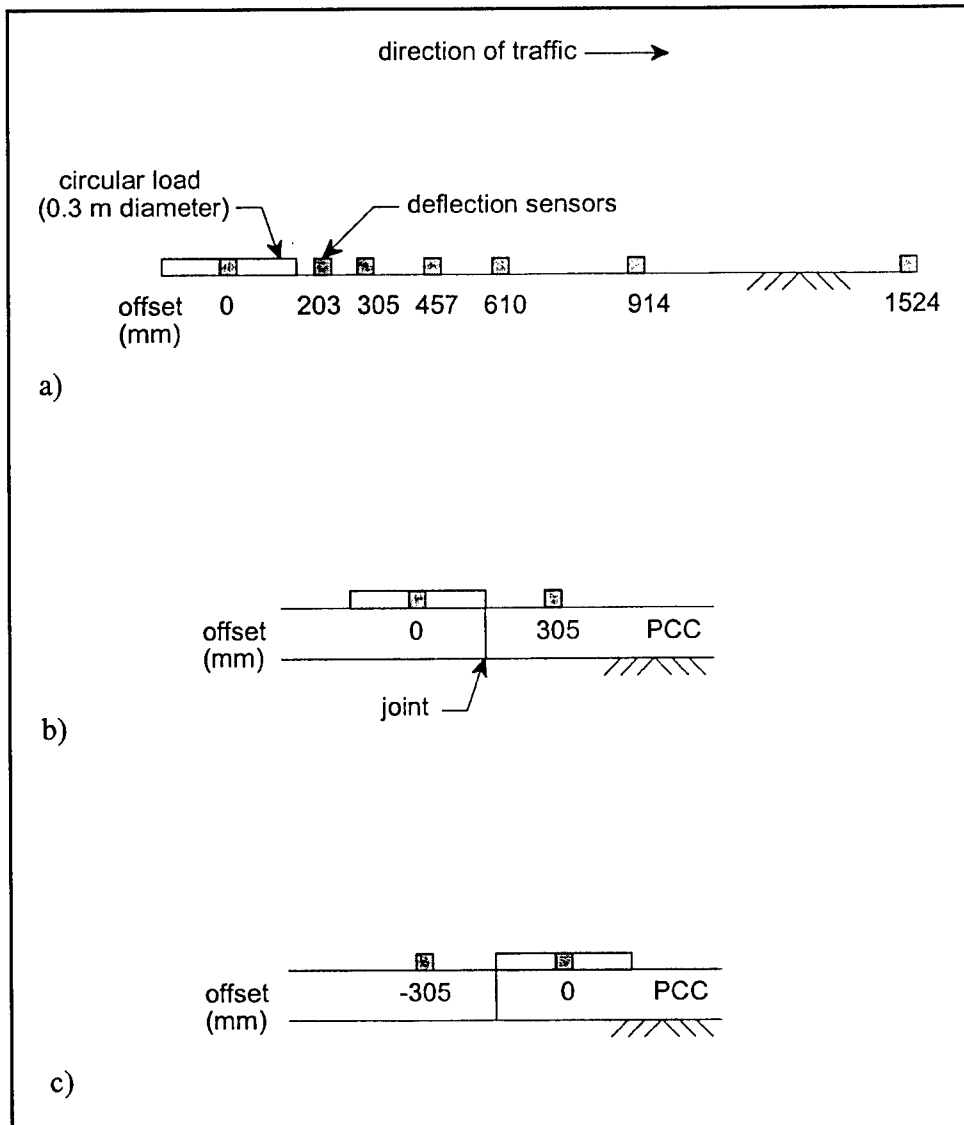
Deflection sensor configurations for (a) basin tests, (b) leave slab load transfer tests, and (c) approach slab load transfer
